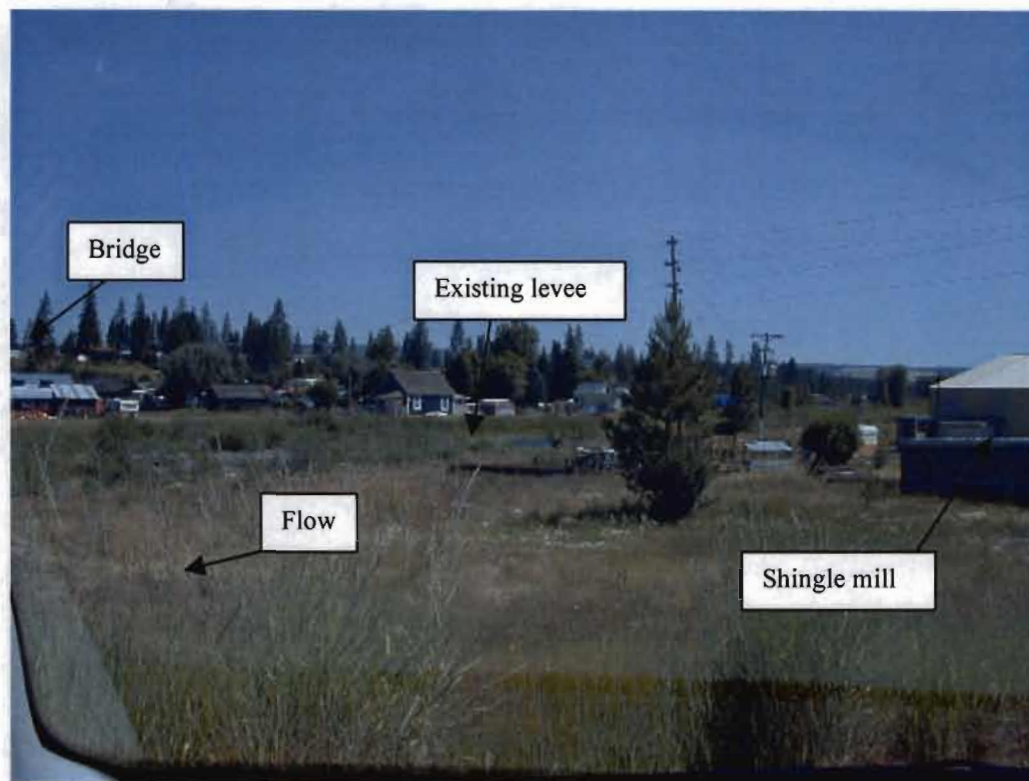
View looks east at Camas Creek (on south edge of town).
